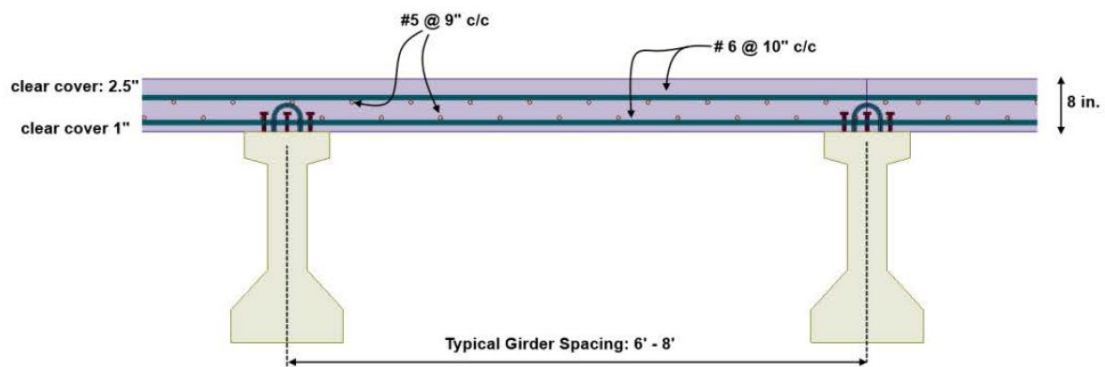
Details of a standard Iowa DOT bridge (Aaleti et al., 2017).
